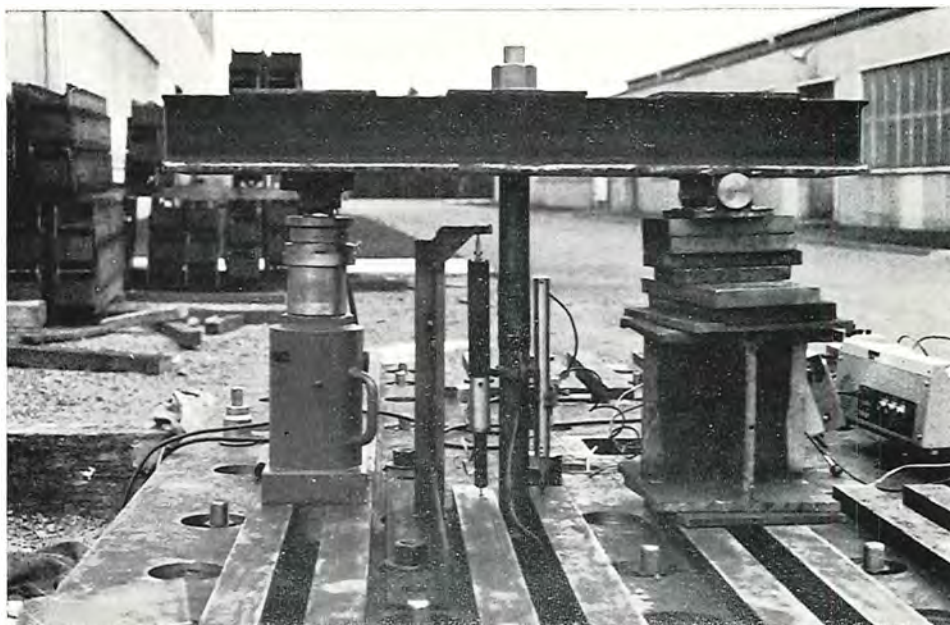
Method of applying proof load to welds of mooring plate.
